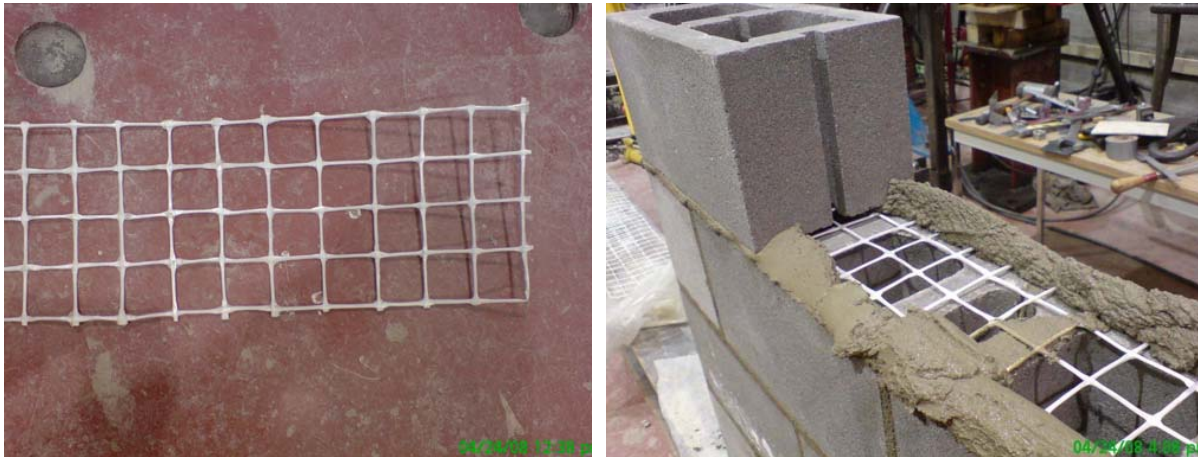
GFRP Bed Joint Reinforcement (Grid Shape) in Wall-G(G)
